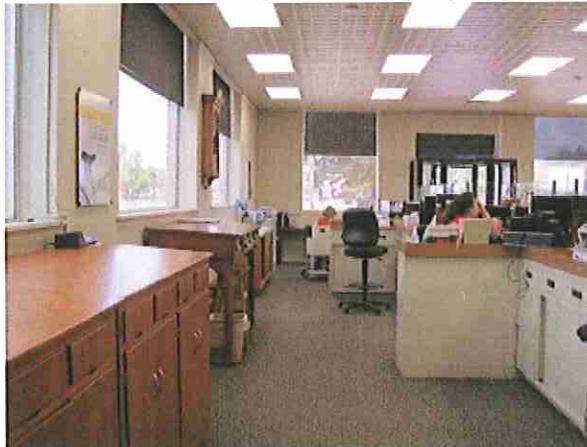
Wall plaster (multi-color, bumpy) and carpet mastic (green/yellow).
